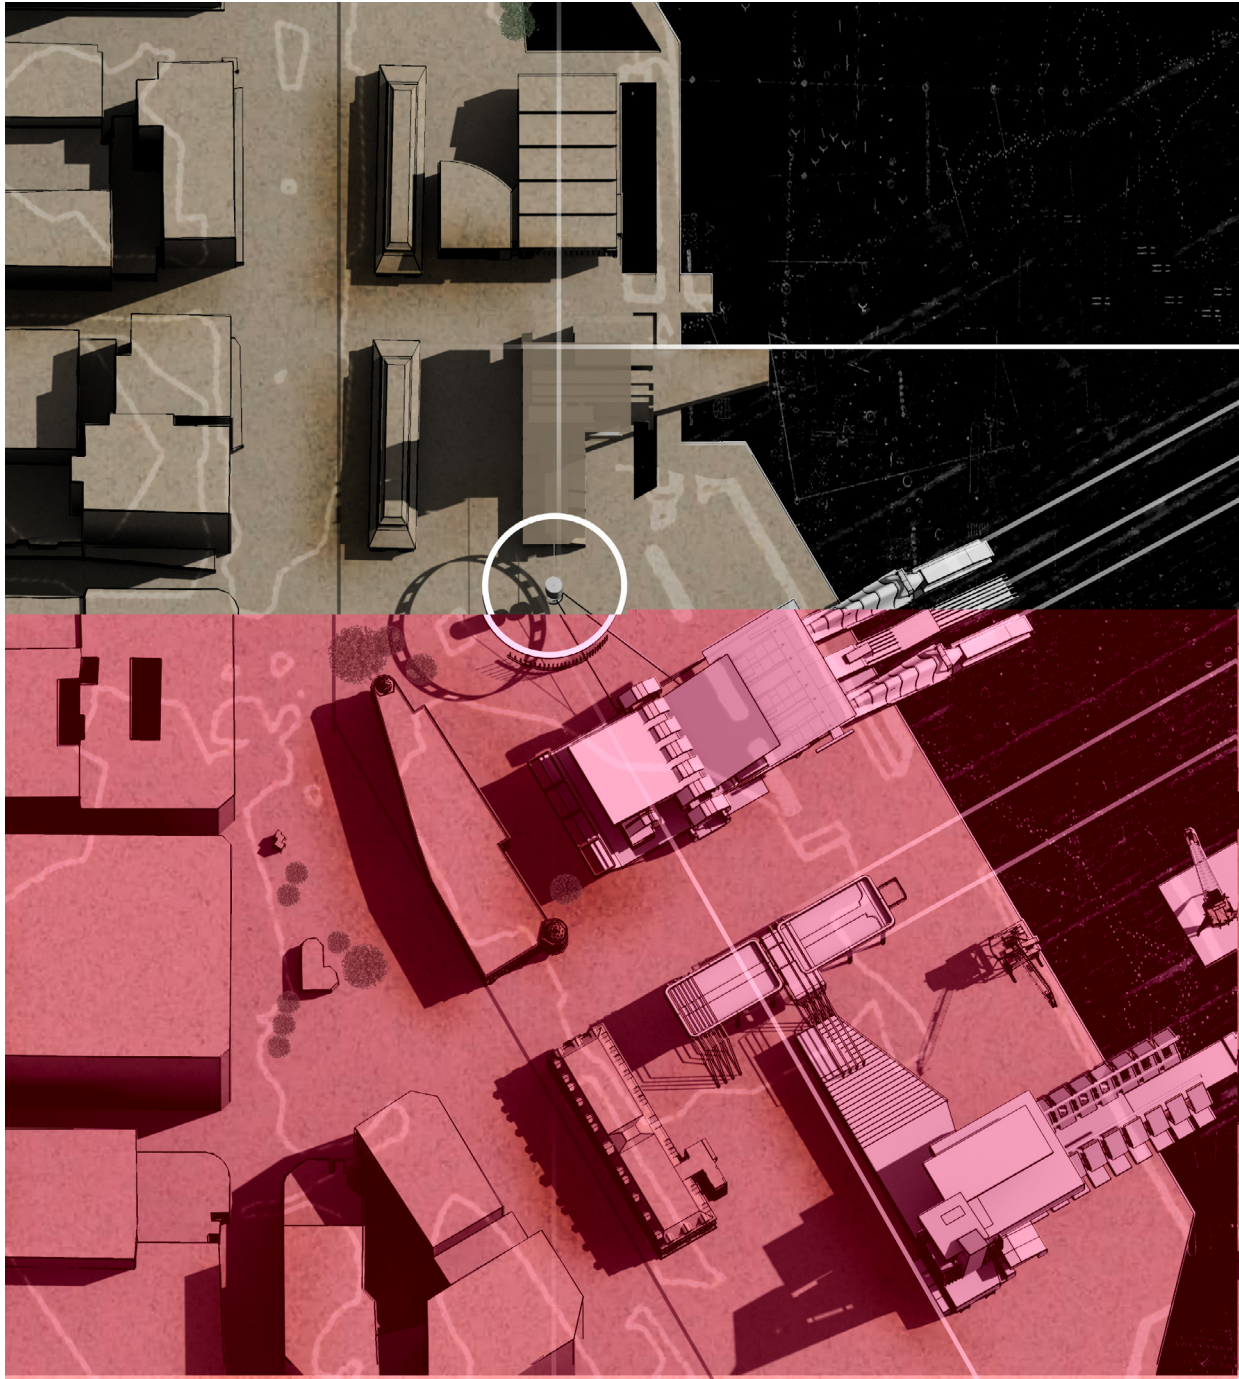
Experimenting with master plan 1 towards the “stand-alone” concept
